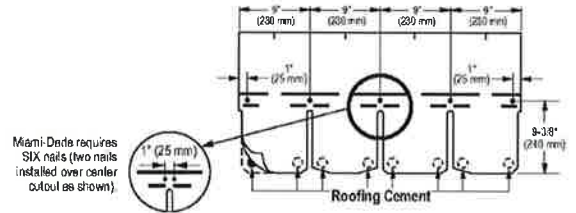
A: Use FIVE nails and eight spots of asphalt roofing cement under each tab corner.
